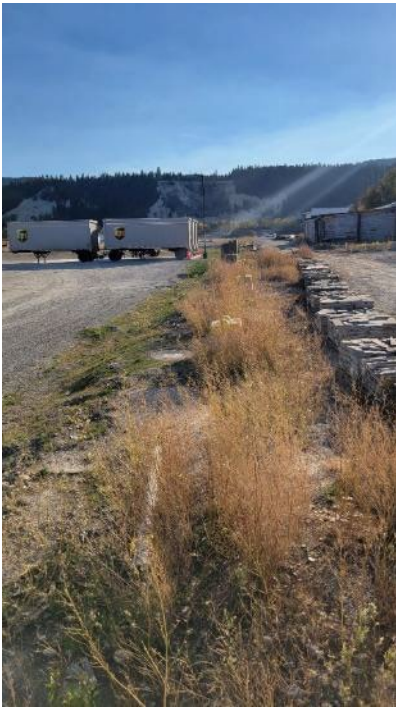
Southeast corner of fire pond, looking north. Note east bank is graded and de-vegetated.
